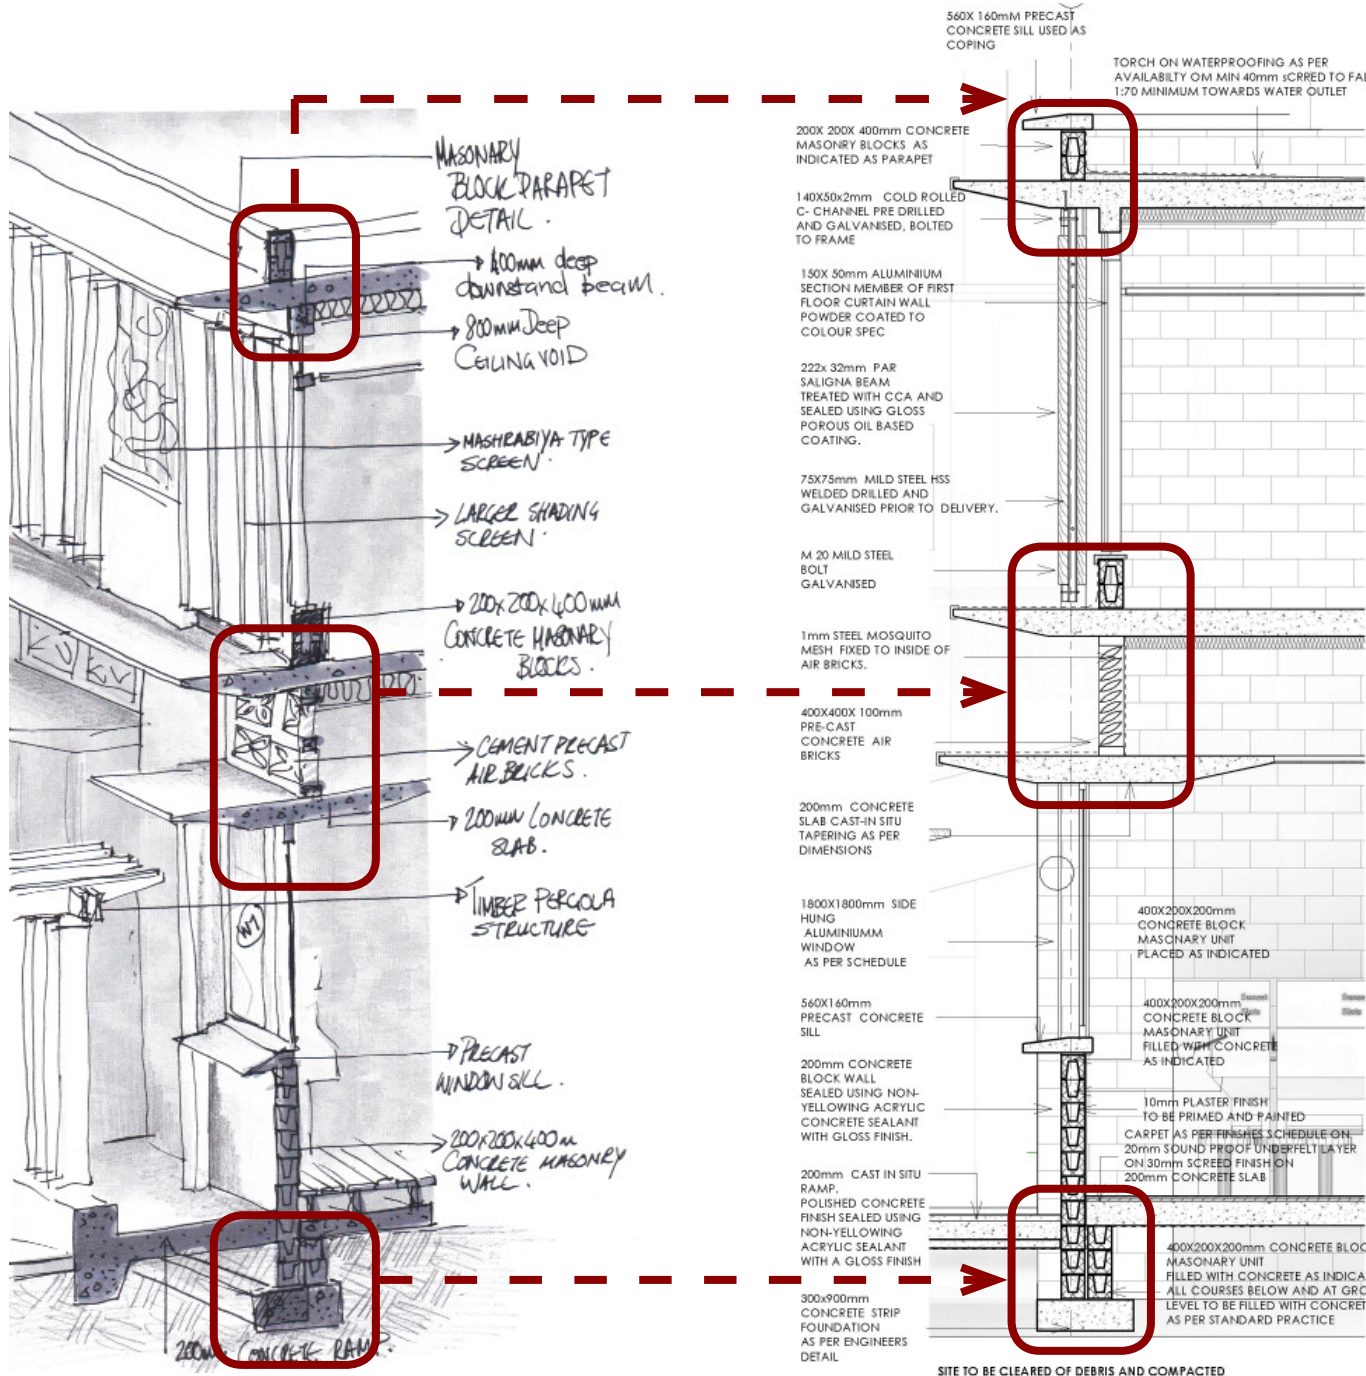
Detail development of Pavement- Entrance ramp threshold
